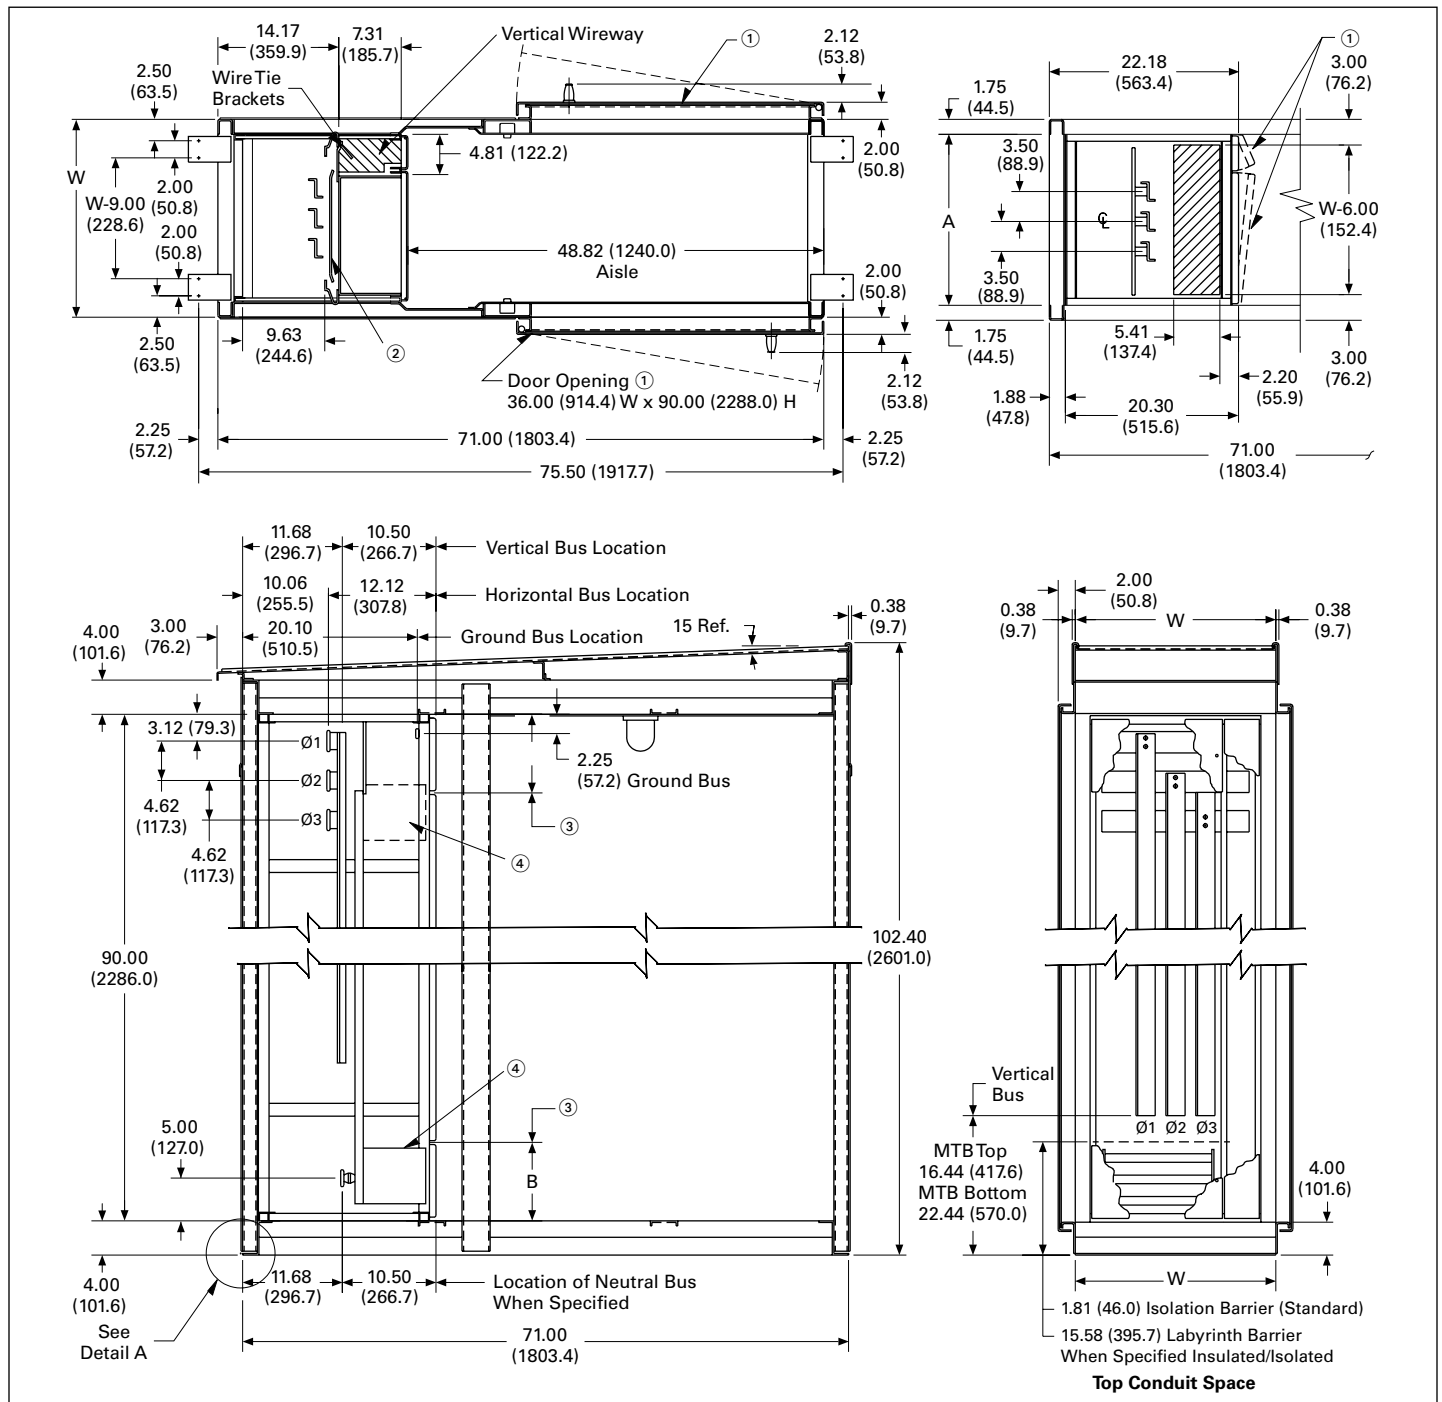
Freedom and Freedom FlashGuard Motor Control Center Outline and Floor Plan NEMA 3R 28.85-Inch (732.8 mm) Deep Structure—Dimensions in Inches (mm)
